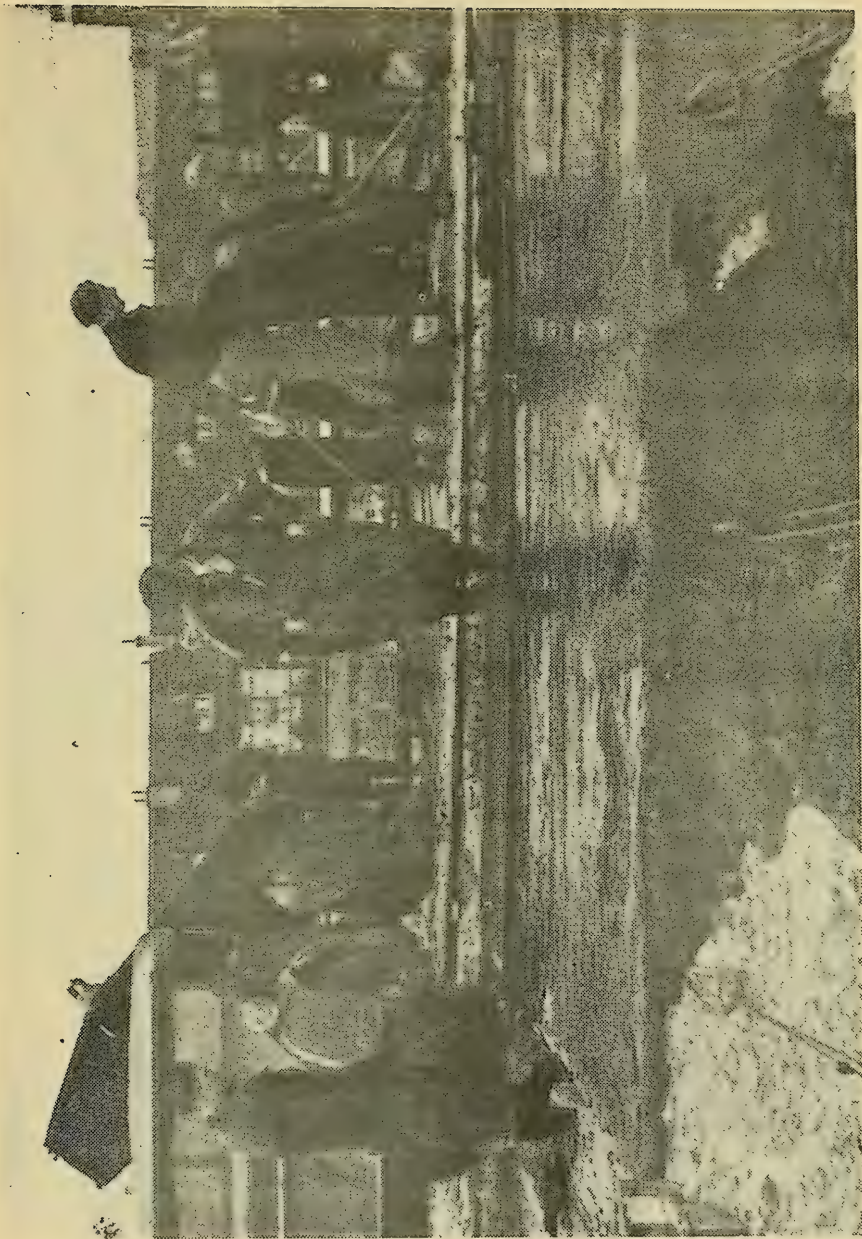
New north harbor at Harlingen. The casting of an asphalt mattress (13 x 5 m; thickness, .15m) being completed on top of first layer (.075 m thick) on which the lifting cables were placed and strung.
